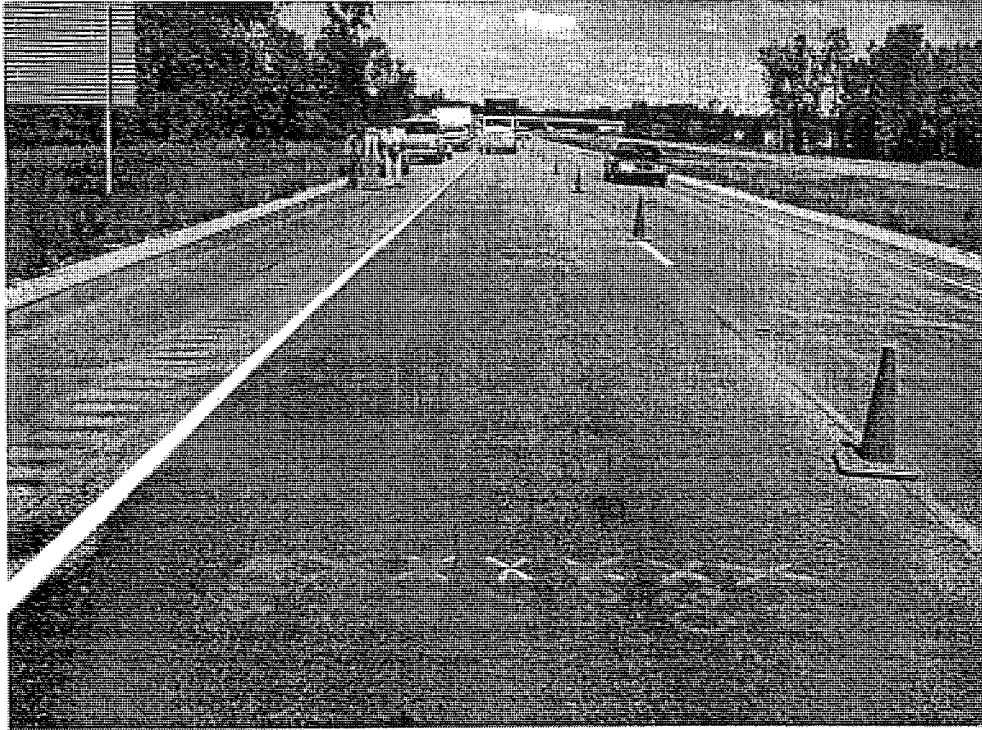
US-27 SB section 4 test site 1 before the exit to M-20
